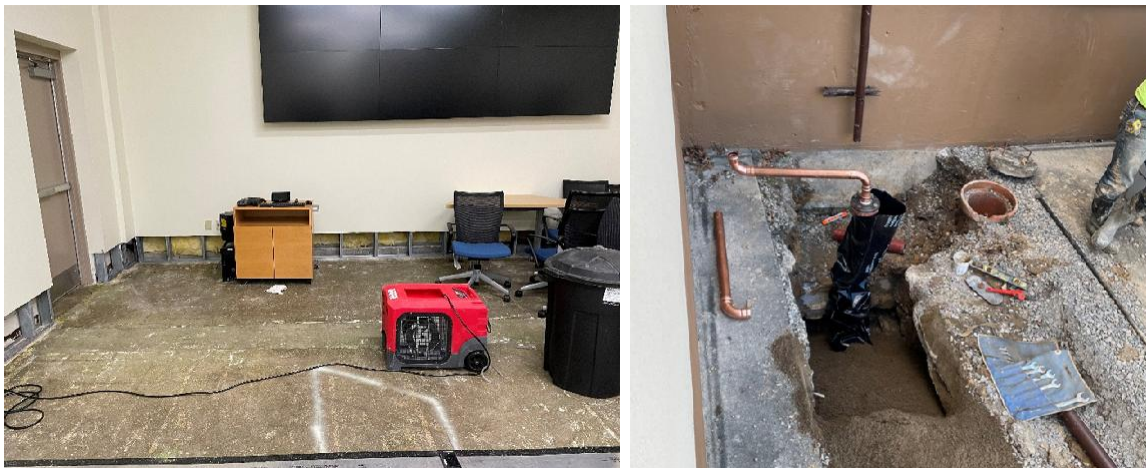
Drying and removal of damaged carpet and drywall inside B-3 (left) and installation of new water line building connection (right).
